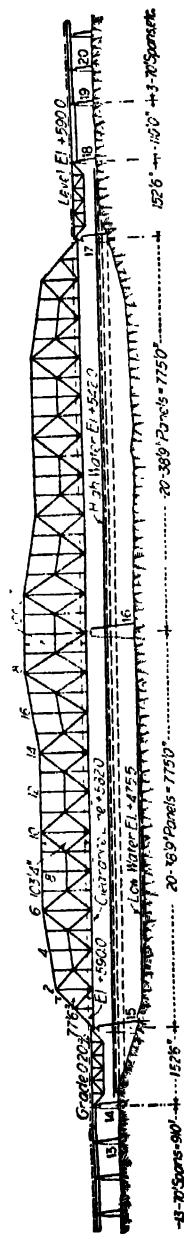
Proposed Bridge over the Ohio River at Sciotoville, O.
